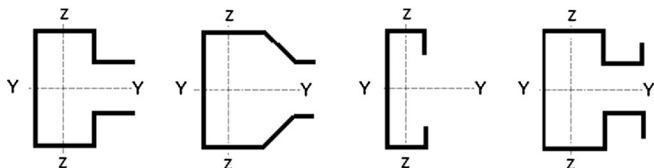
Examples of cross-section for uprights in adjustable pallet racks.
